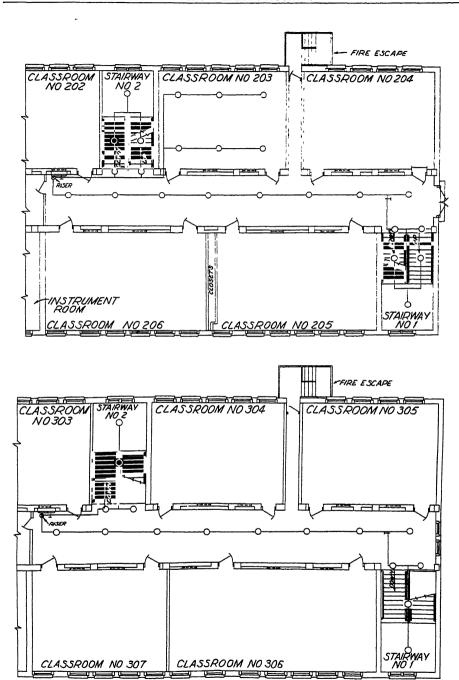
Cont. Floor plans of second (upper drawing) and third floors showing location of automatic sprinklers.
